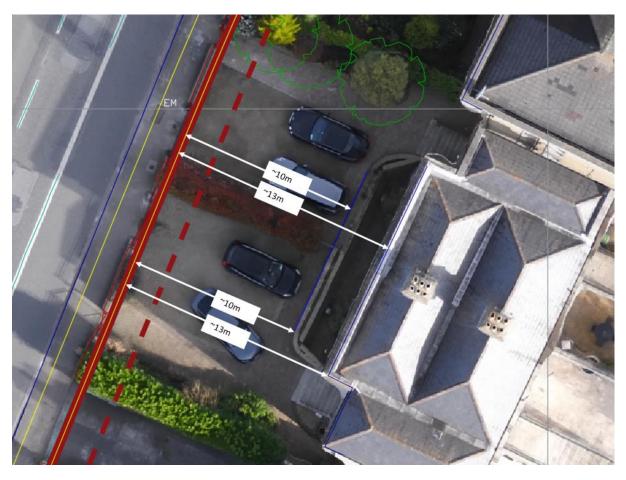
Proposed set back distances at Winston Ville 64 and 62 Malahide Road
